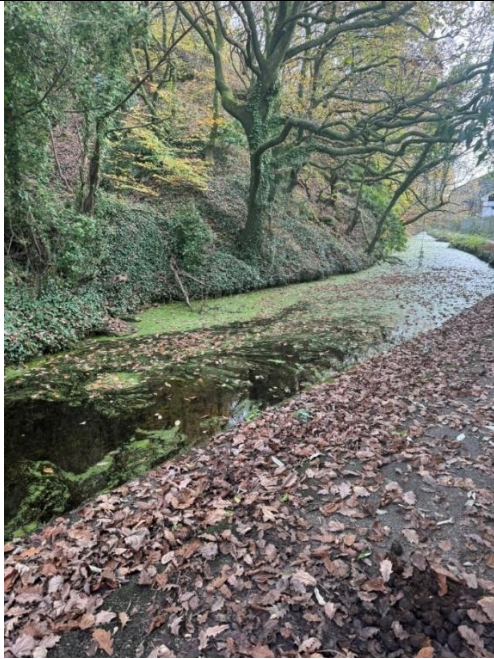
Pipe Bridge - Evidence of Neath canal condition
